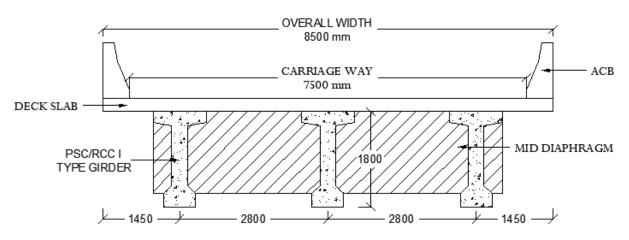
Typical cross Section of Bridge at Mid span Location.
